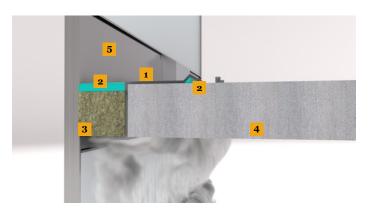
1) Metal sheet, 2) Fire rated silicone, 3) Mineral wool, 4) Concrete slab, 5) Fire rated wall
